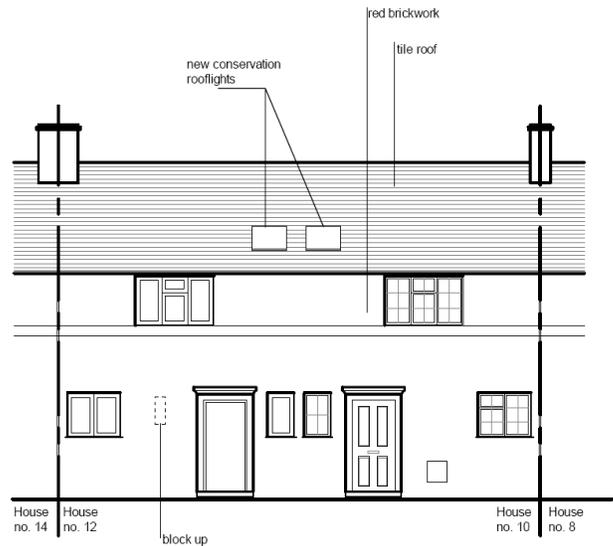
approved rooflights to nos 10 and 12 laneway front façade
